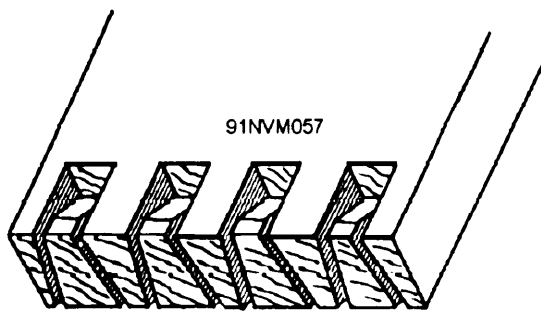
Chiseling out waste in a through multiple-dovetail joint.
